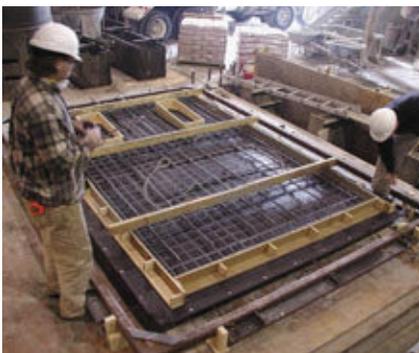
Securing fabric and placing reinforcement in full scale wall panel formwork (C.A.S.T. photo)
